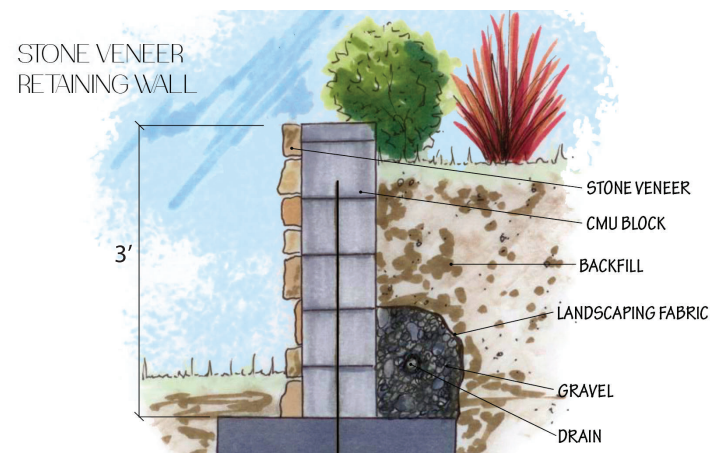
A section of a typical concrete block retaining wall with a stone veneer.
